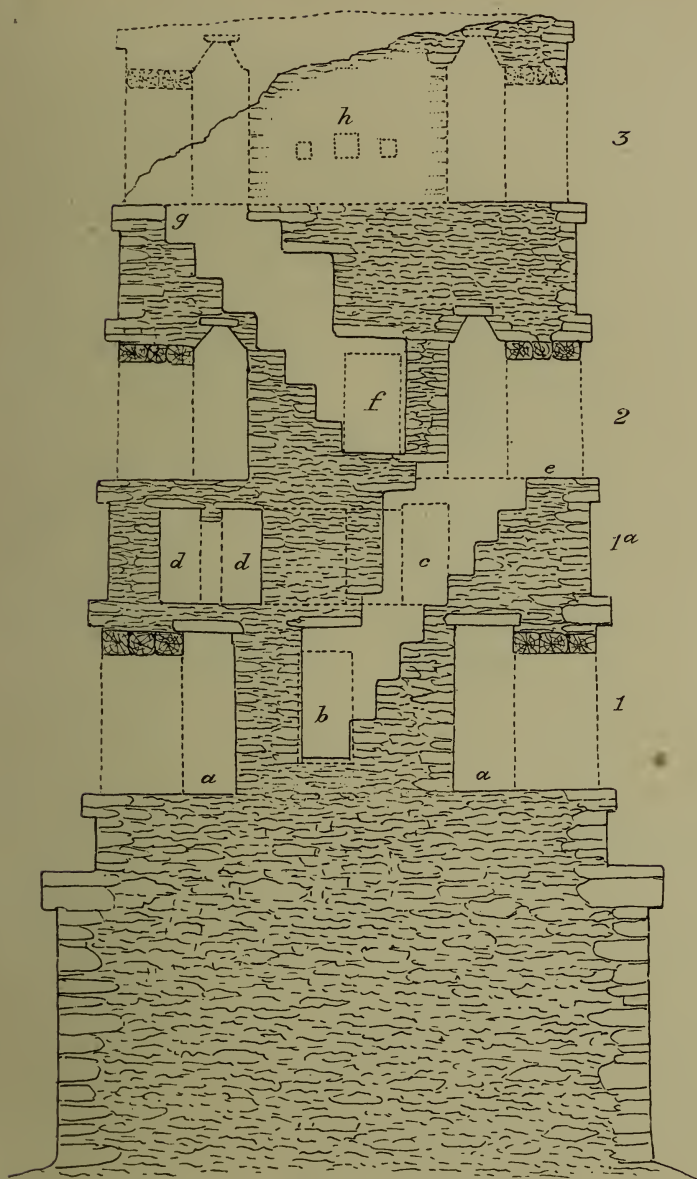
SECTION OF TOWER FROM NORTH TO SOUTH, SHOWING STAIRWAYS AND CONSTRUCTION.
